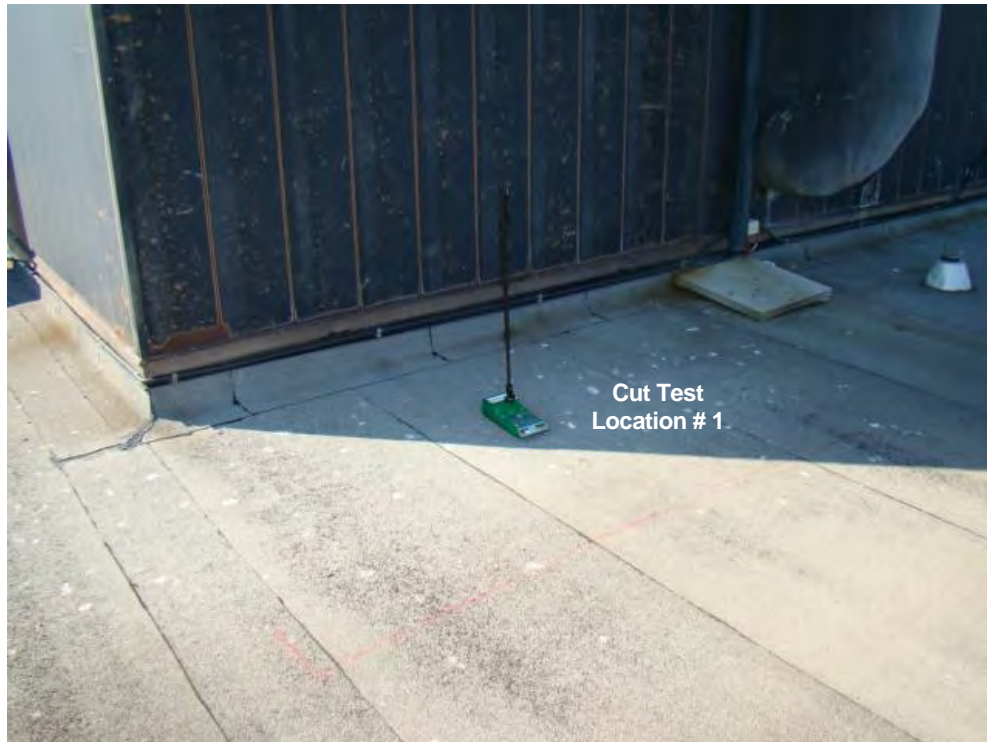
Roof Area 1.2 – Openings in sealant along reglet flashing details may be contributing to leakage.
